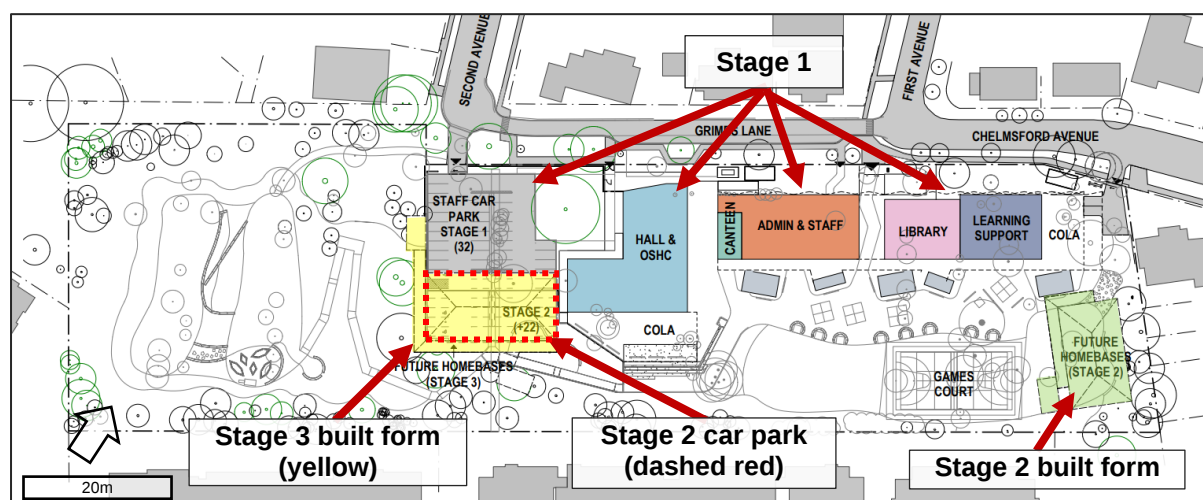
| Concept site layout (Source: Applicant's RtS 2021)
